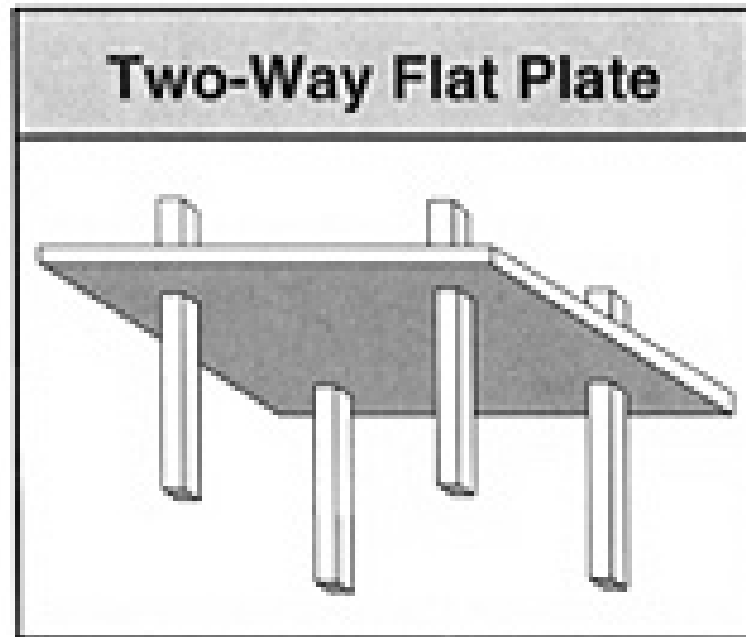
Typical Two-Way Flat Plate (www.crsi.org)
